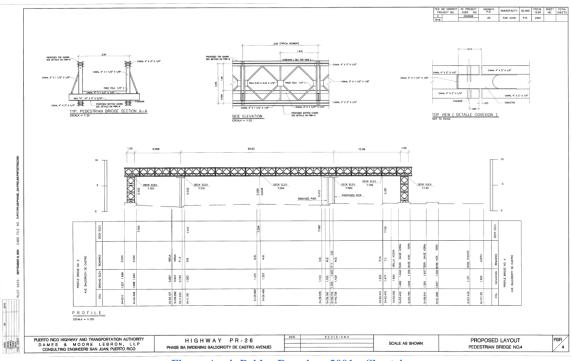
Bridge Drawings 2001 – Sheet 4
